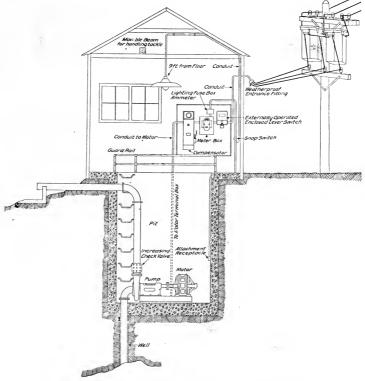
Pumping Plant Installation Arranged for 220- or 440-volt, Three-phase Motor
